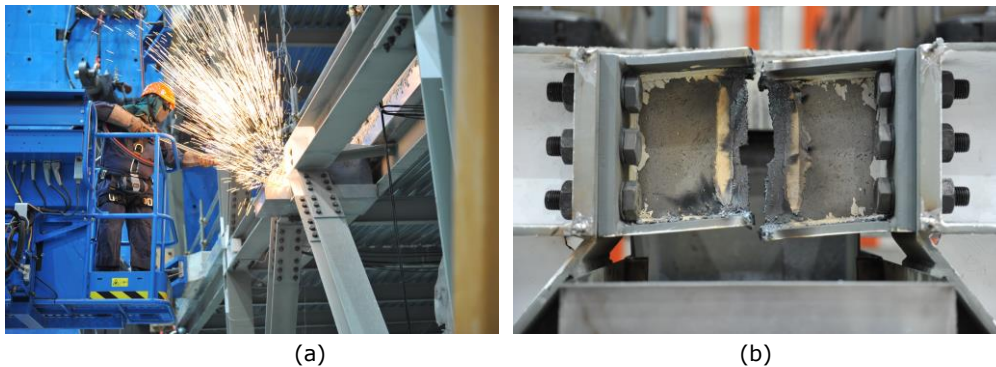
Link removal by flame cutting and unscrewing bolts
